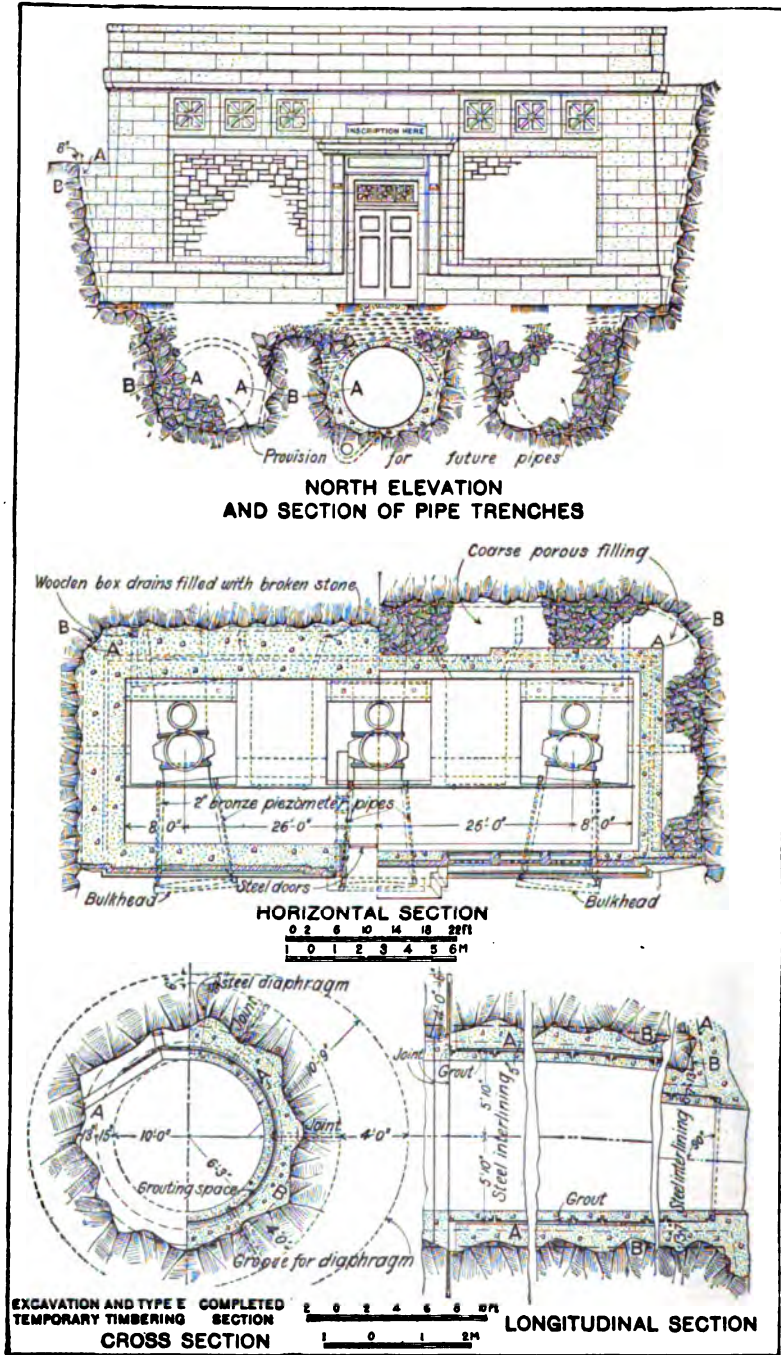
Junction Chamber of Yonkers Pressure Tunnel and Bryn Mawr Steel Pipe Siphon. Shows method of concreting pipes in tunnel.
